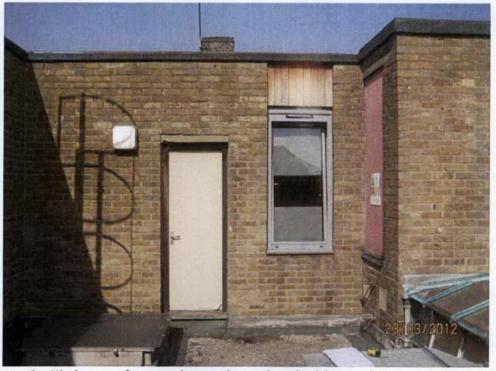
Kitchen roof access door to be replaced with powder coated aluminium glazed door to match replacement aluminium windows adjacent
